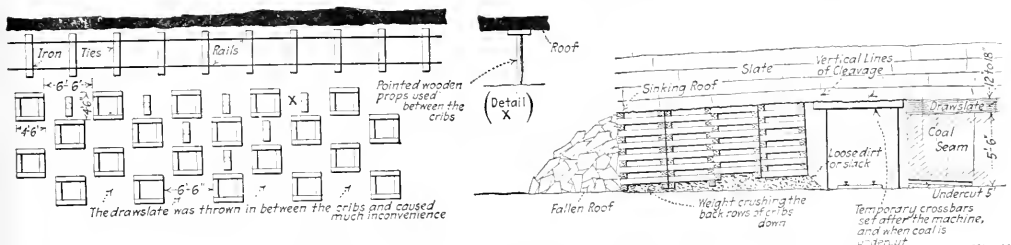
DETAILS OF METHOD EMPLOYED IN WORKING A SEAM ON LONGWALL PLAN
